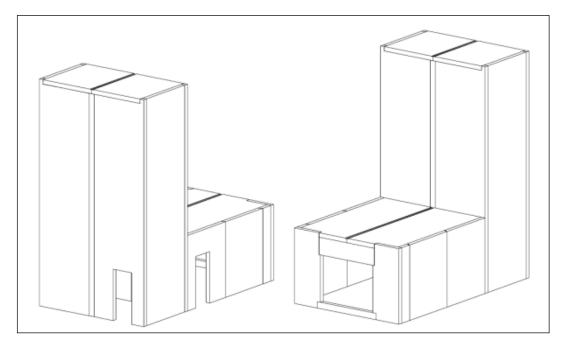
Layout of fire compartment and neighbouring lift shaft in Su and Muradori, 2014.
